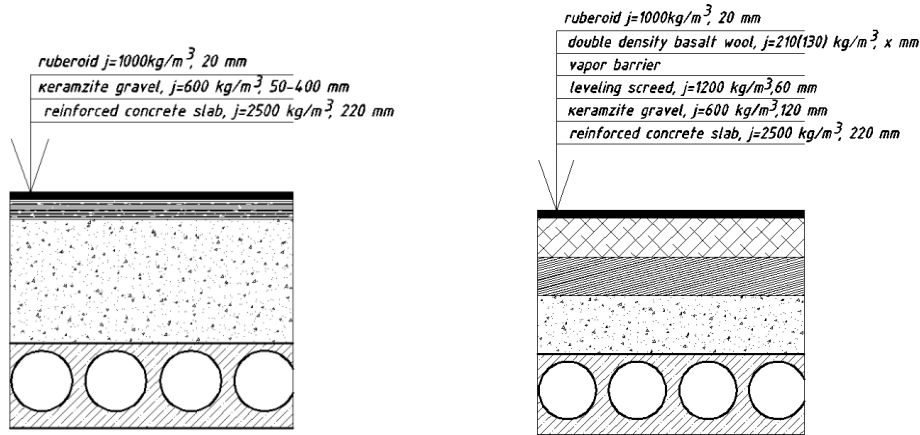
Examples of typical design schemes for combined roofs: a) existing coating; b) Insulated covering.
